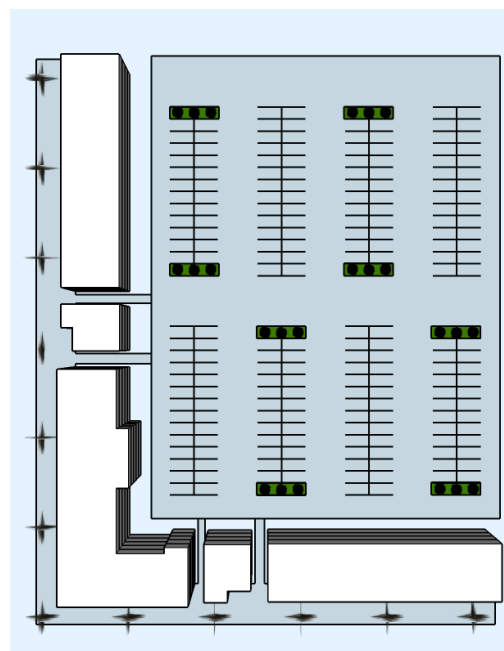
Traditional Downtown site layout with buildings brought to the edge of the sidewalk and parking in the rear.
